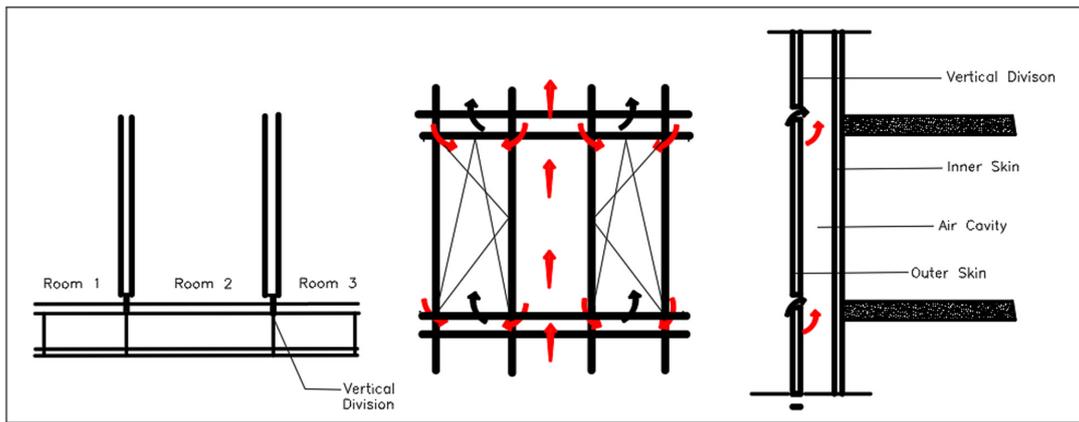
Floor, elevation and section of Shaft box (drawn by author).
